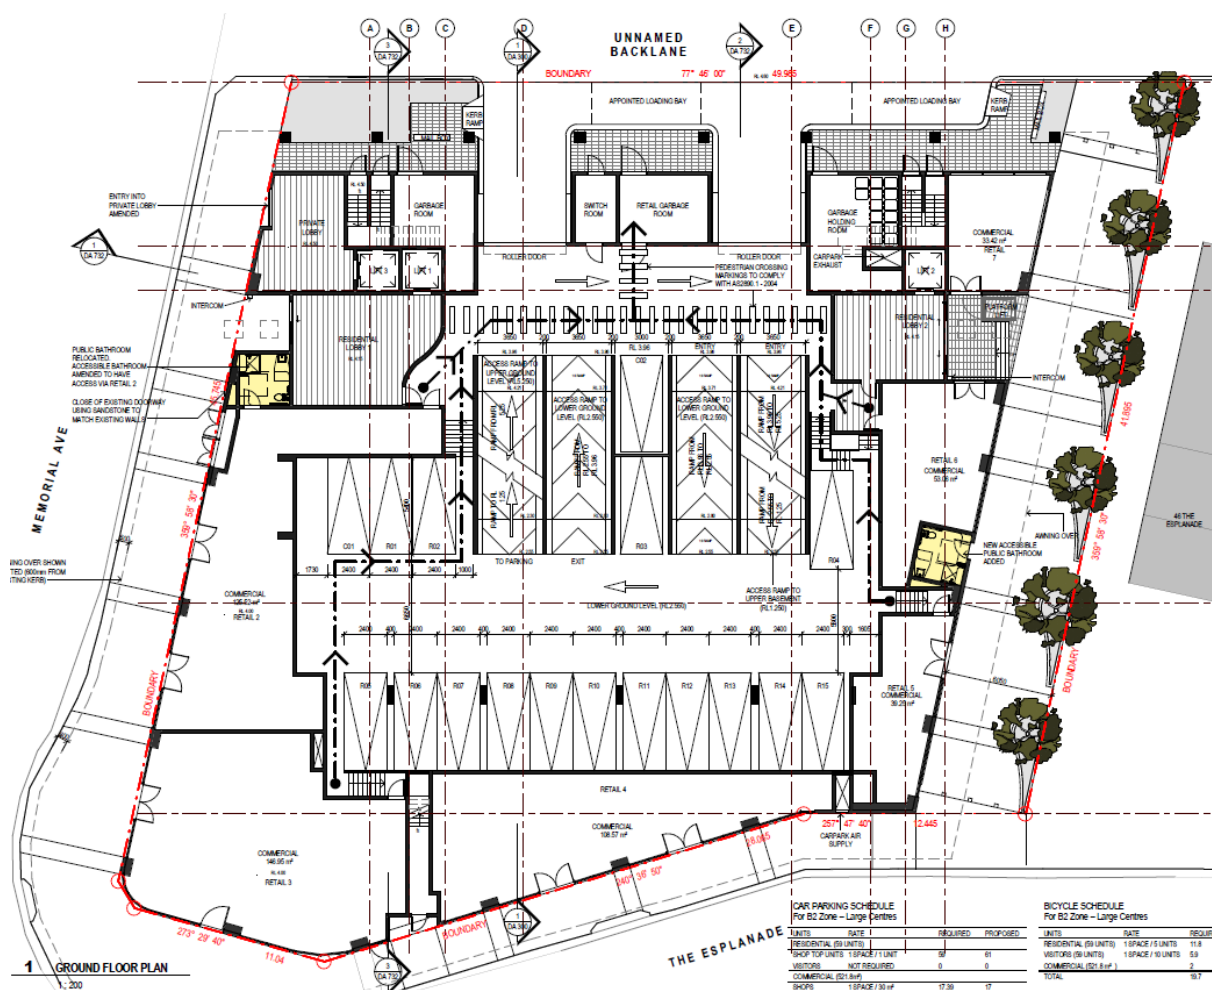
Proposed Ground Level modifications pertaining to bathroom facilities
